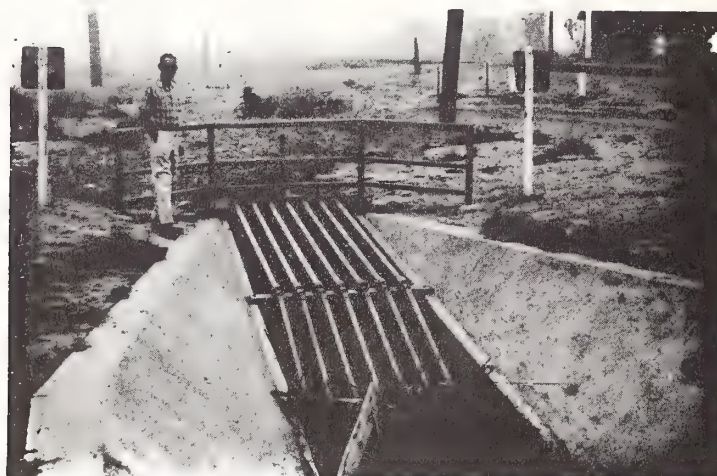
Pipe grill debris rack. Vertical fence at downstream end to prevent debris from spreading over ponding area.
